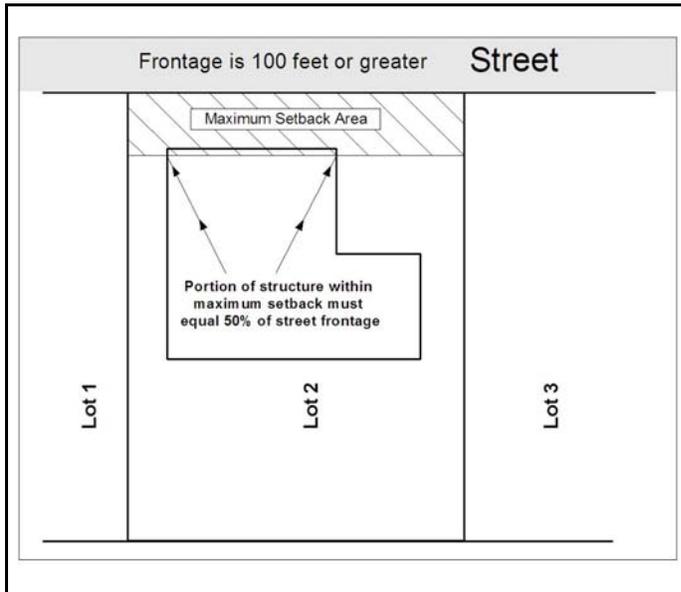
Portion of Building Required in Setback Area on Sites with At Least 100 ft. of Street Frontage
